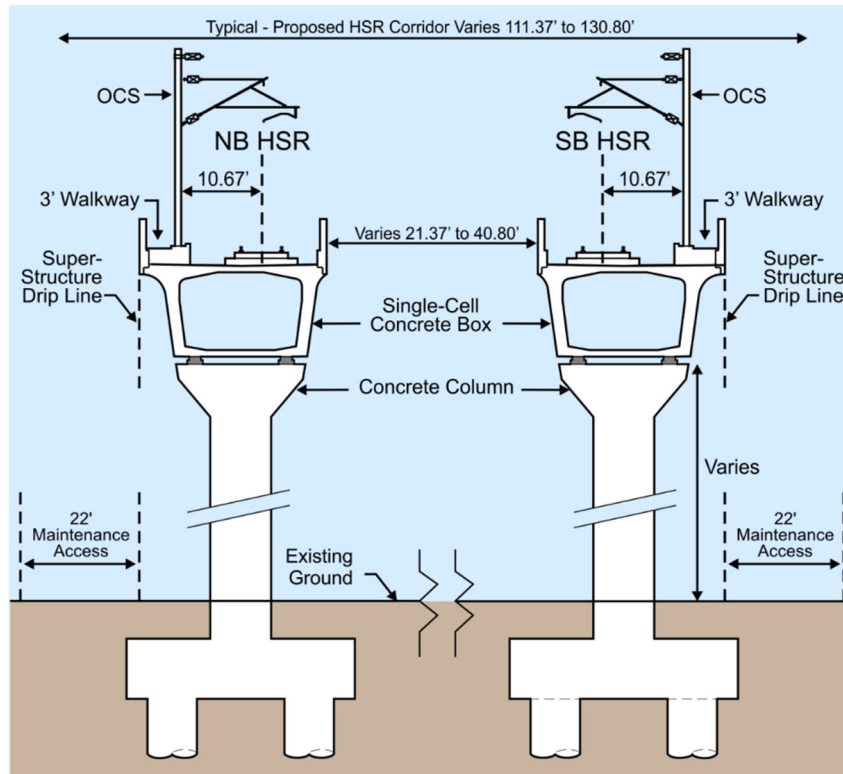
Elevated Twin-Structure Typical Cross Sections
